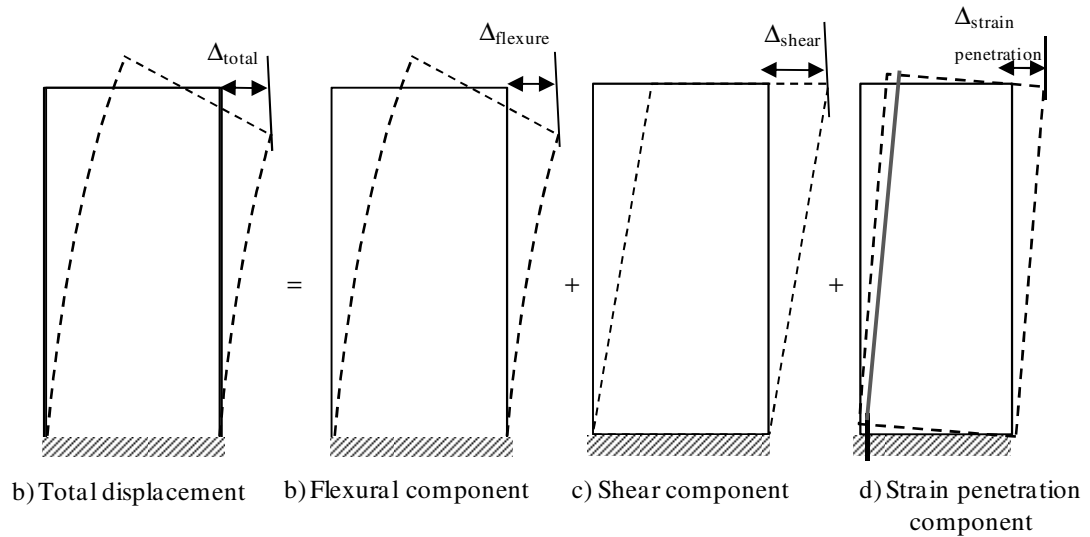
Deformation components expected in a reinforced concrete structural wall subjected to a lateral force
